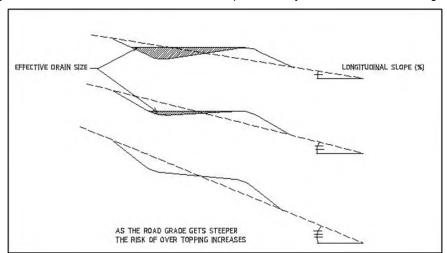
Cross Flow Whoa Boys - Cross Sections
